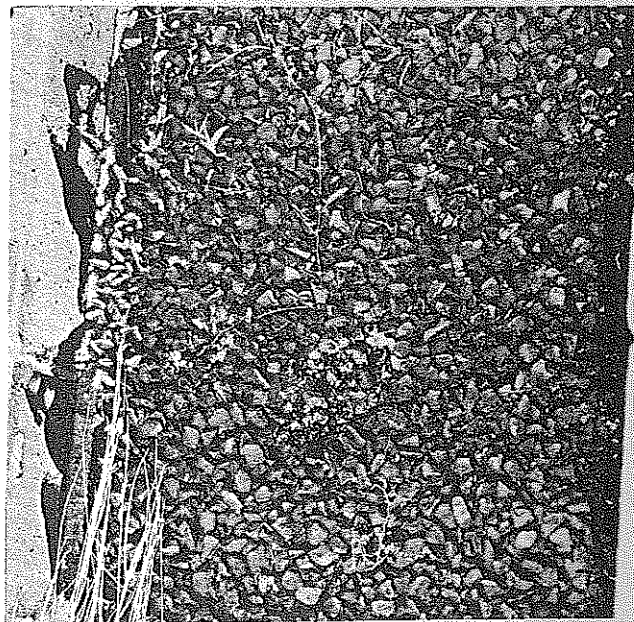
Test bed with 2 inches layer of Macadam (bed shown is that in long brick channel used for subsequent tests. Note grass especially in left hand corner).
